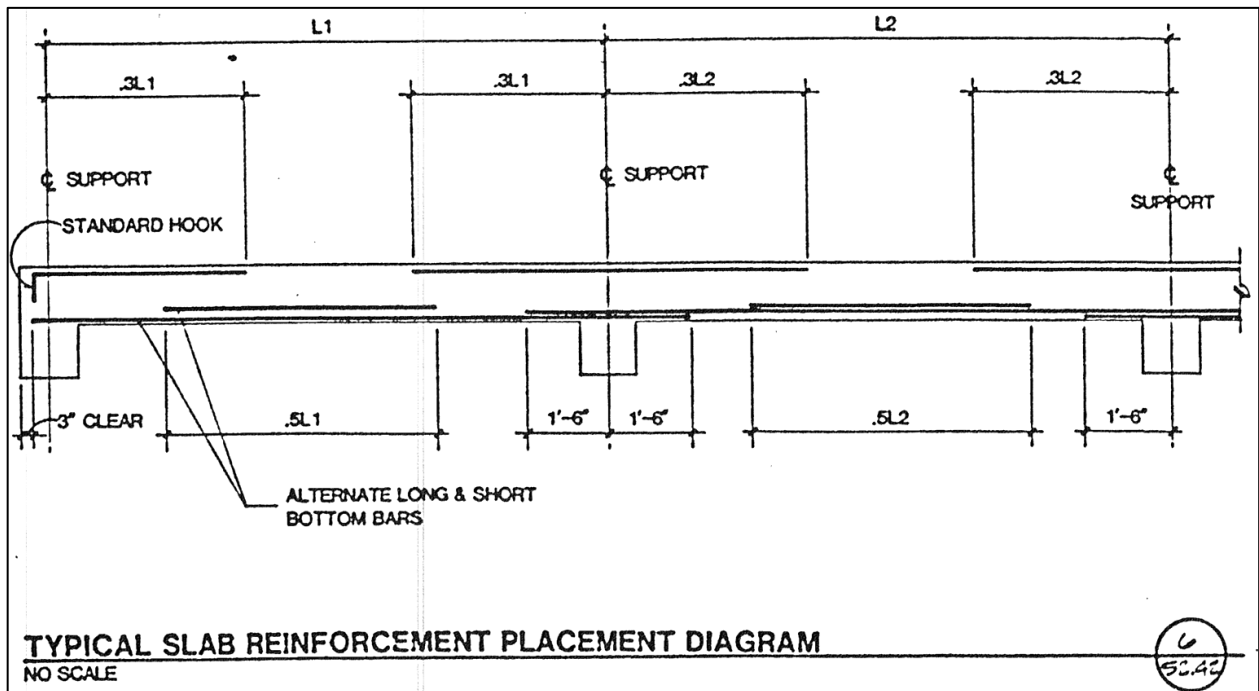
Schematic of the epoxy-coated rebar running through the slab across beam supports and at the end of the slab, from the as-built 1988 structural drawings.
